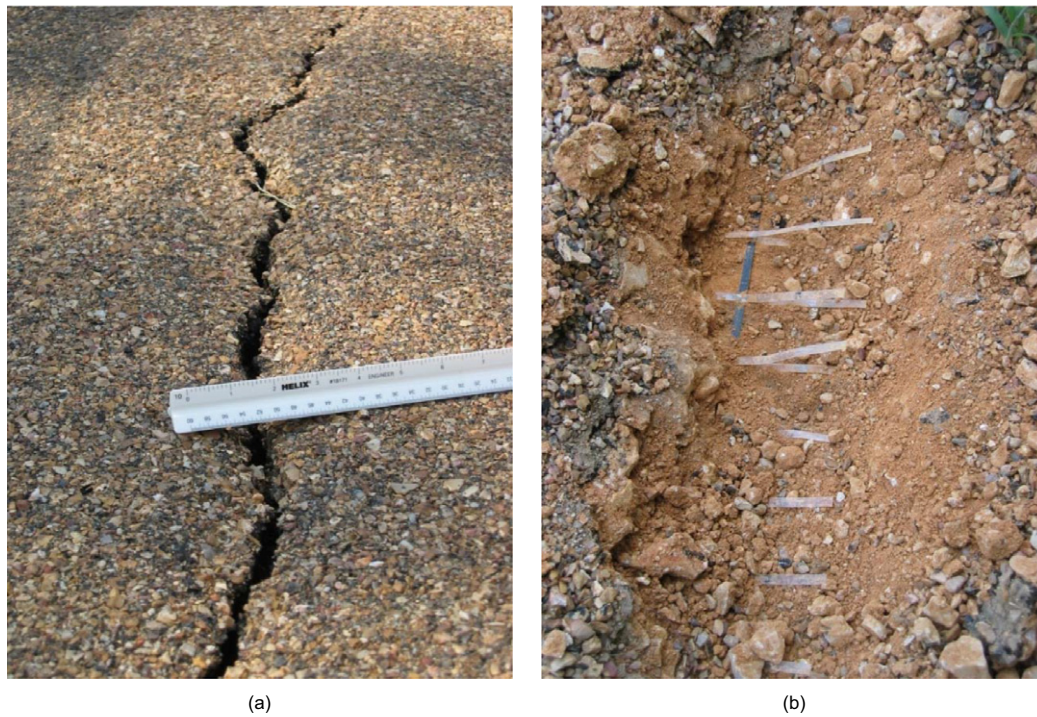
View of longitudinal cracks observed in 2004 at FM1774 test section stabilized using GS2 in Case Study B: (a) view of longitudinal crack on pavement surface; (b) view during forensic evaluation exposing geogrids showing junction failure at location of longitudinal crack
